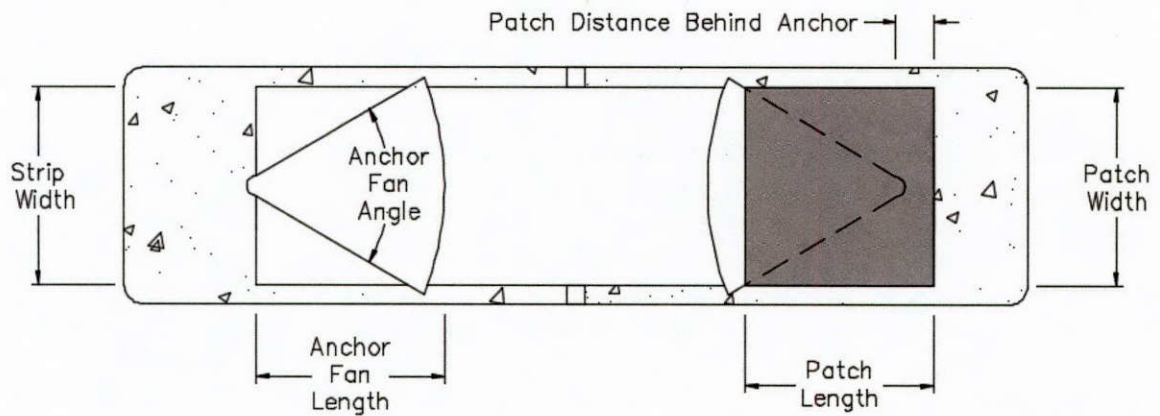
Plan view of anchor system; left: anchor prior to adding patches, right: patches over anchor
